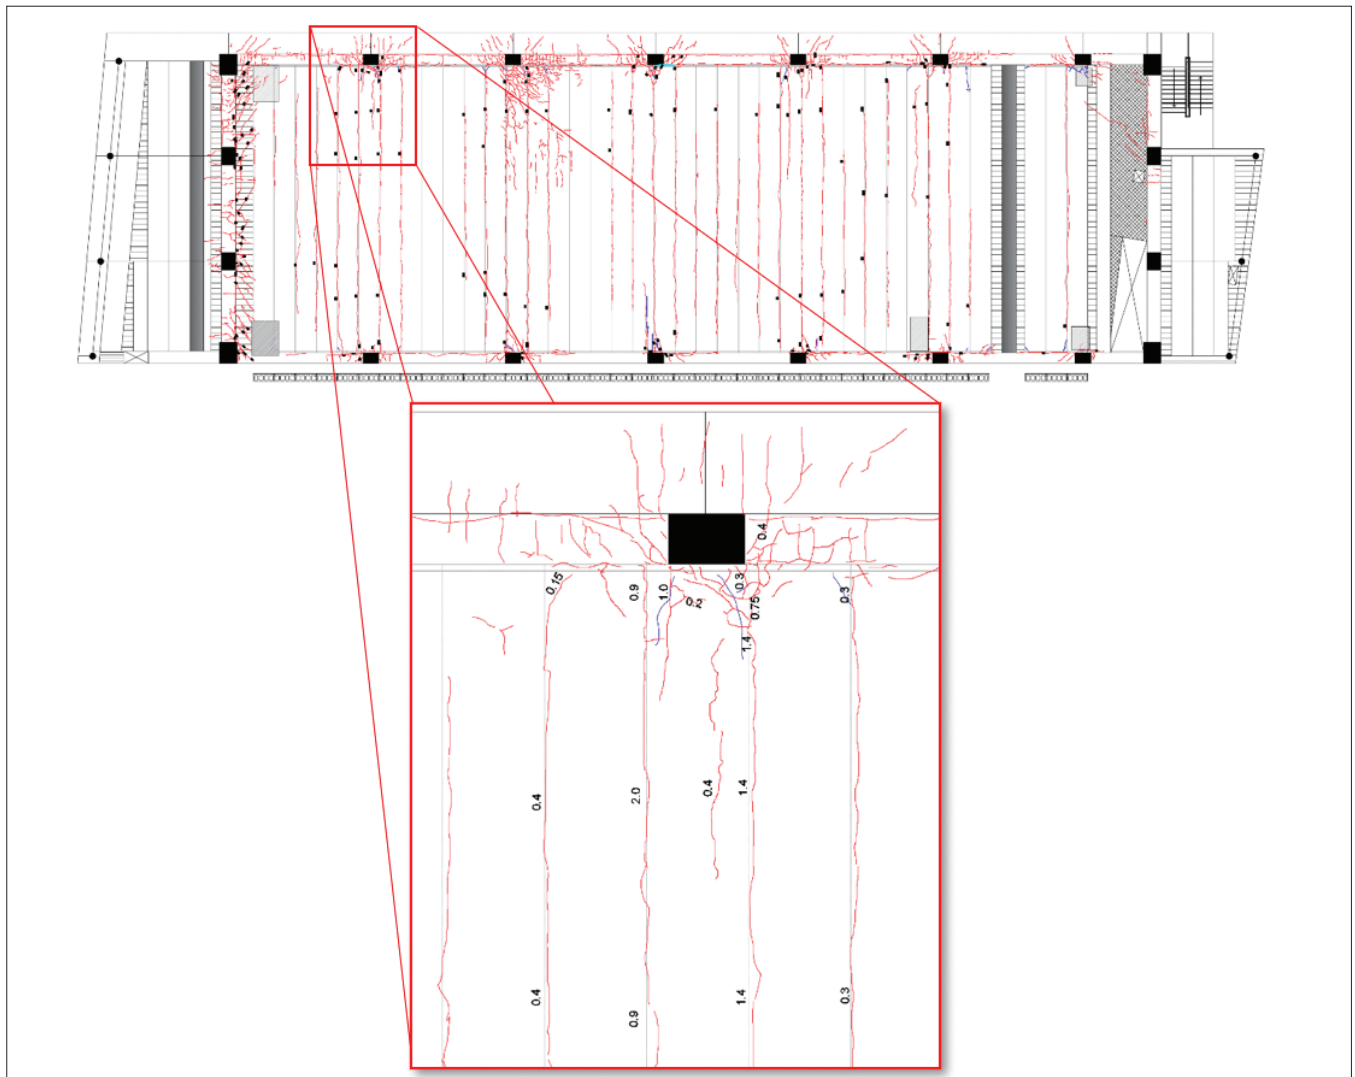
Crack map sample from the second floor in Pier 3 with floor top cracking marked in red, soffit cracks marked in blue, zones was observed in multiple locations in the building (e.g. Figure 9). However, no loss of unit support was observed due to the ledge reinforcement detailing used in this building.
